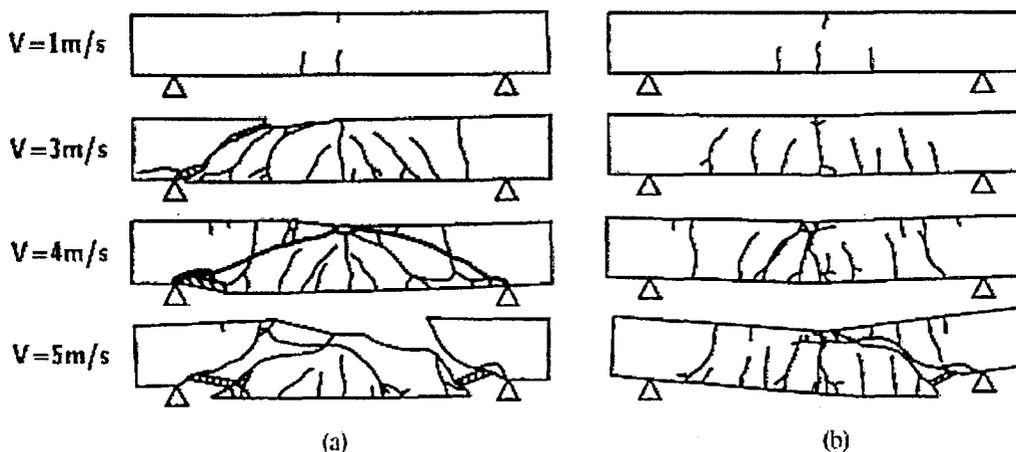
Crack pattern for beam with and without shear rebar sketched by Kishi et al
